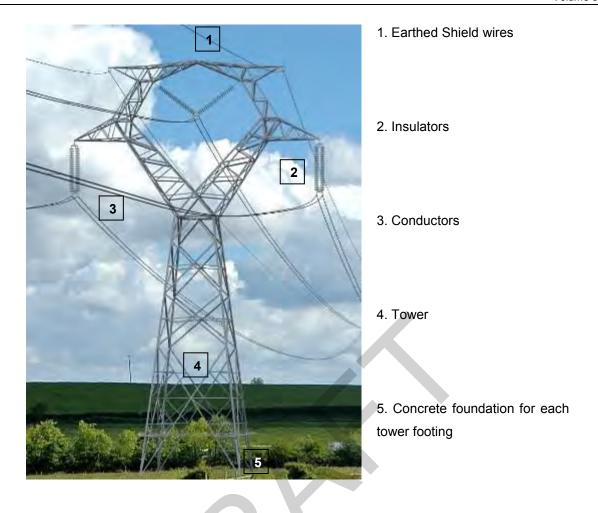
General Arrangement of a C-IVI-1 (IVI) Tower
